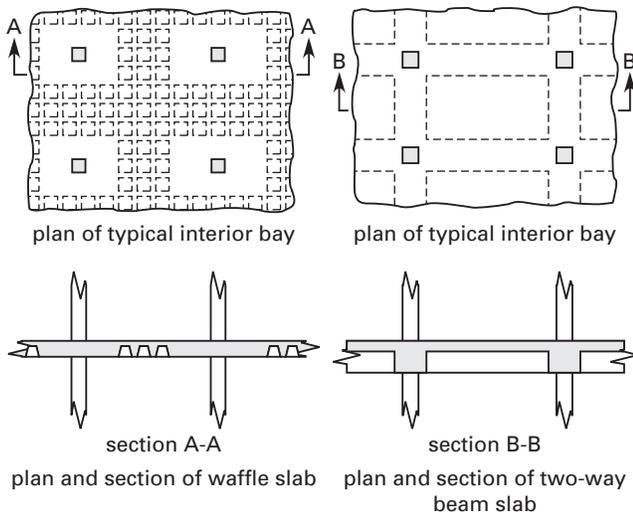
Two-Way Waffle Slab and Beam-Slab Floor Systems
